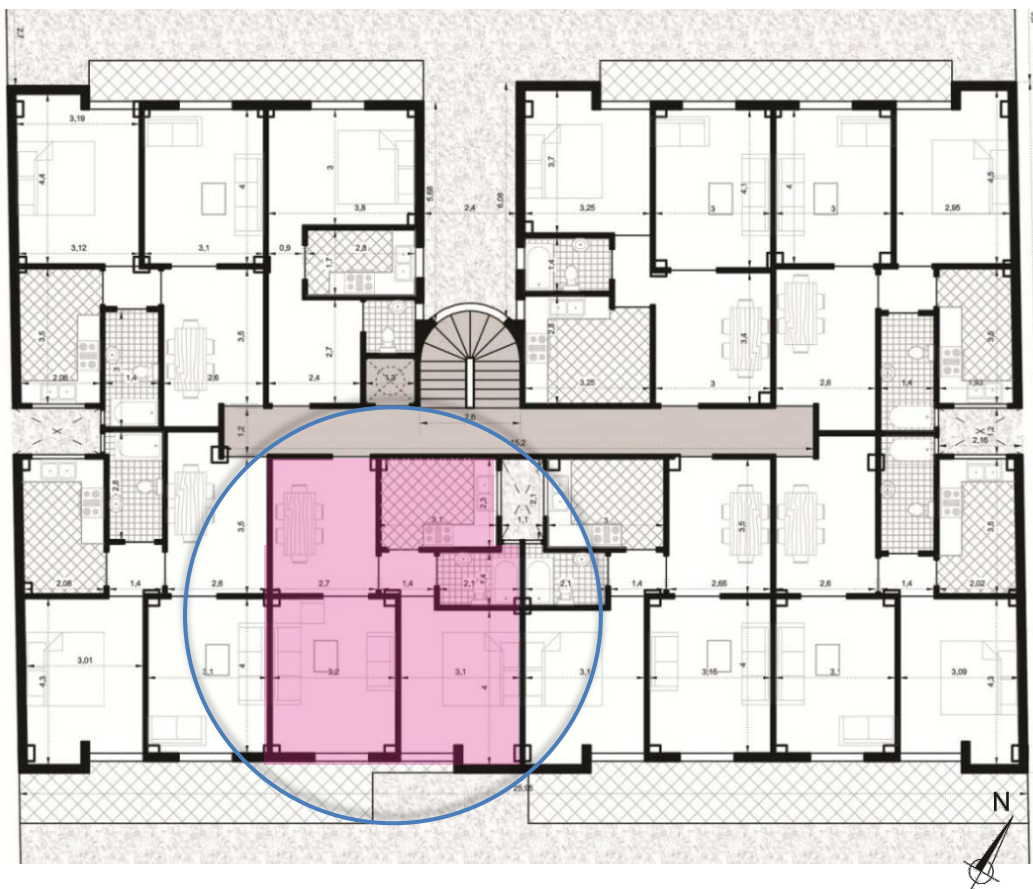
First floor, plan view CAD drawing of the building studied, showing the case study apartment (dimensions in metres, nts)
